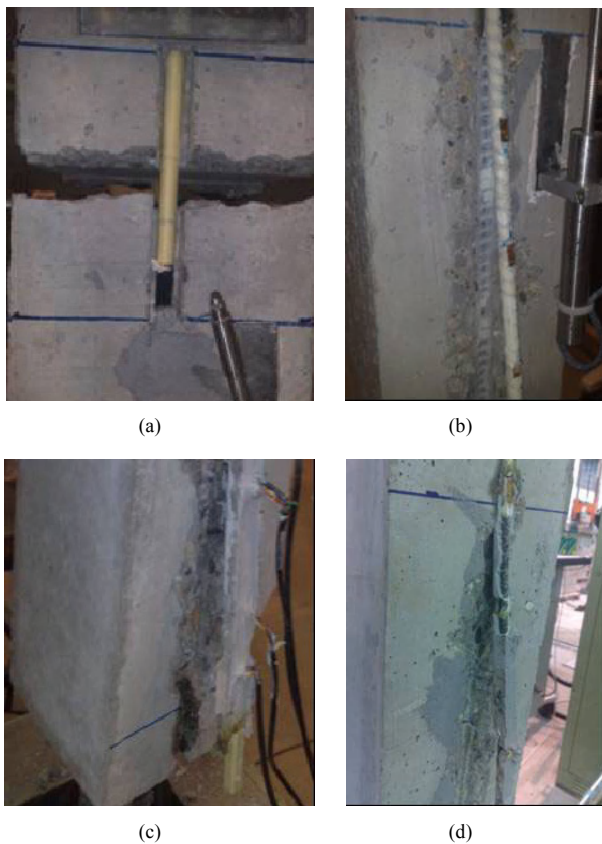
Failure aspects (a) pull-out FRP; (b) resin splitting; (c) debonding at resin-concrete interface with concrete layer; (d) debonding at resin-concrete interface without concrete layer
